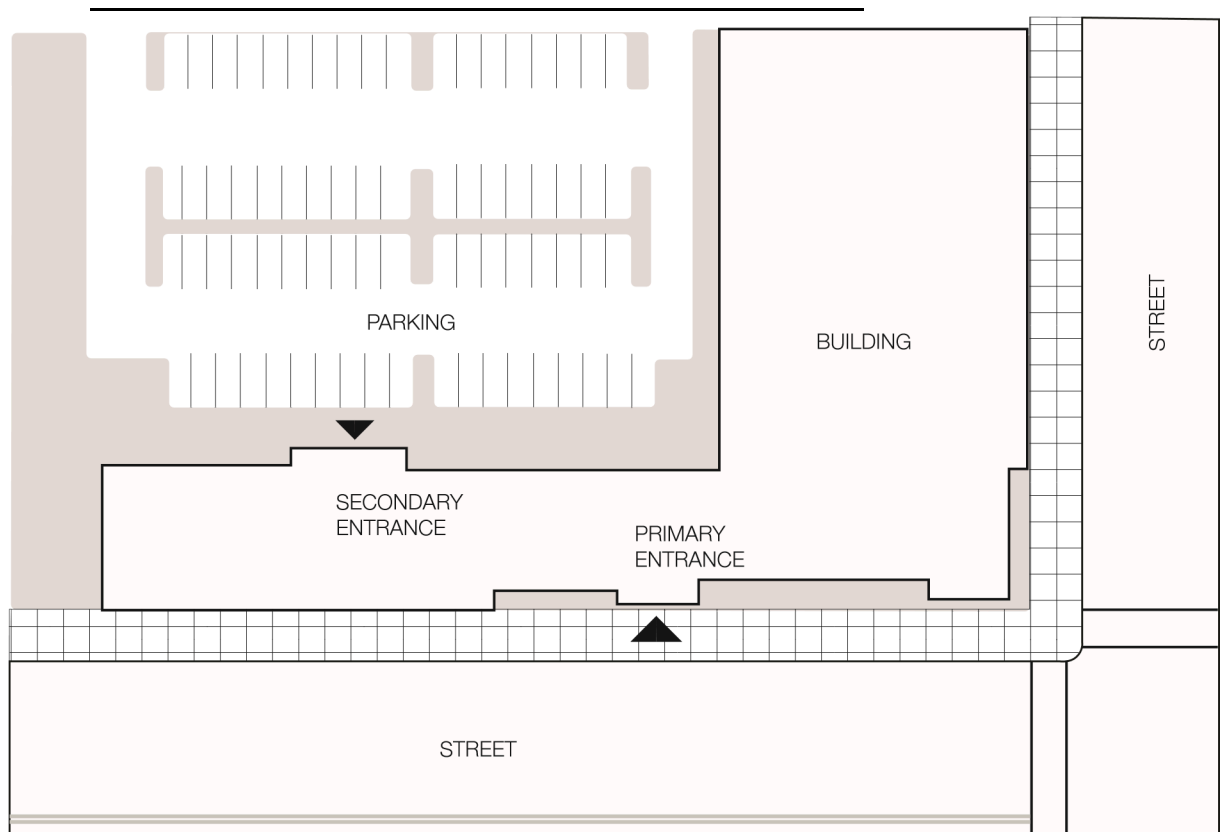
This image shows how parking is located in the inner part of the block to allow buildings to create a continuous sidewalk and street edge. Primary entrances are on the public sidewalk with alternative entrances adjacent to the parking.
